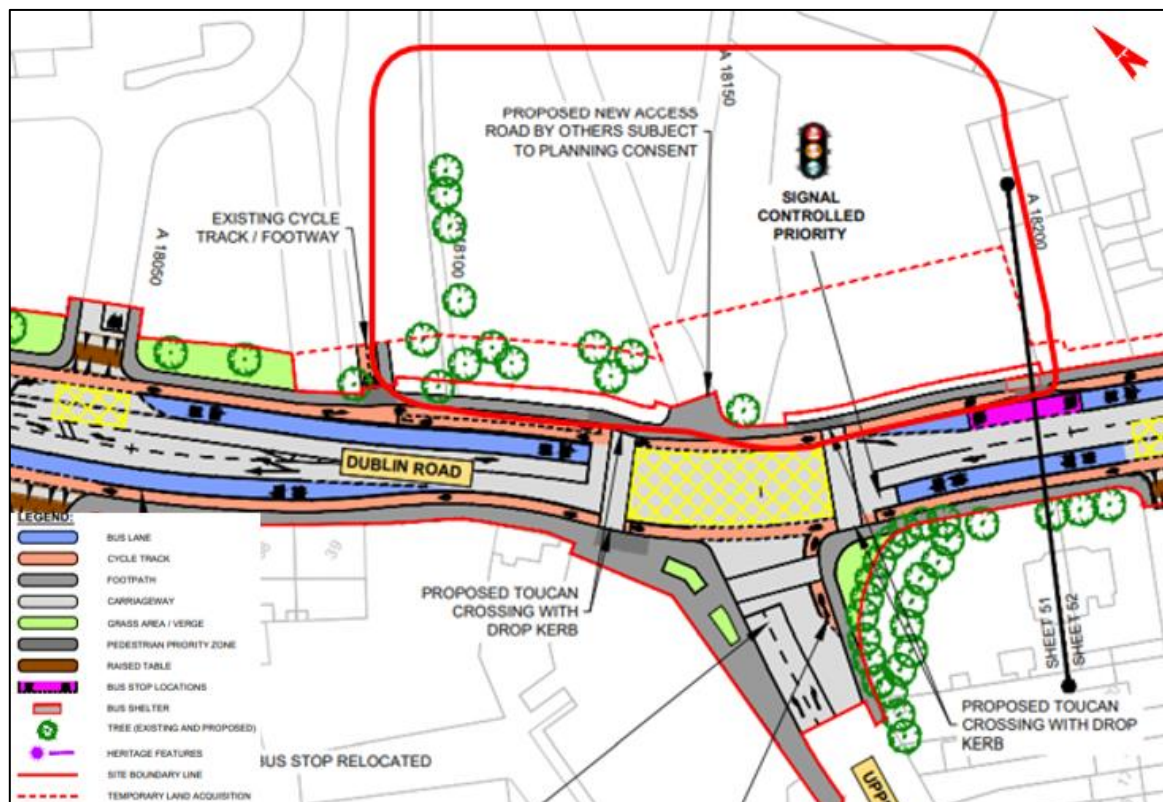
Extract from General Arrangement Drawing at Dublin Road & Castle Street (Sheet 51)
